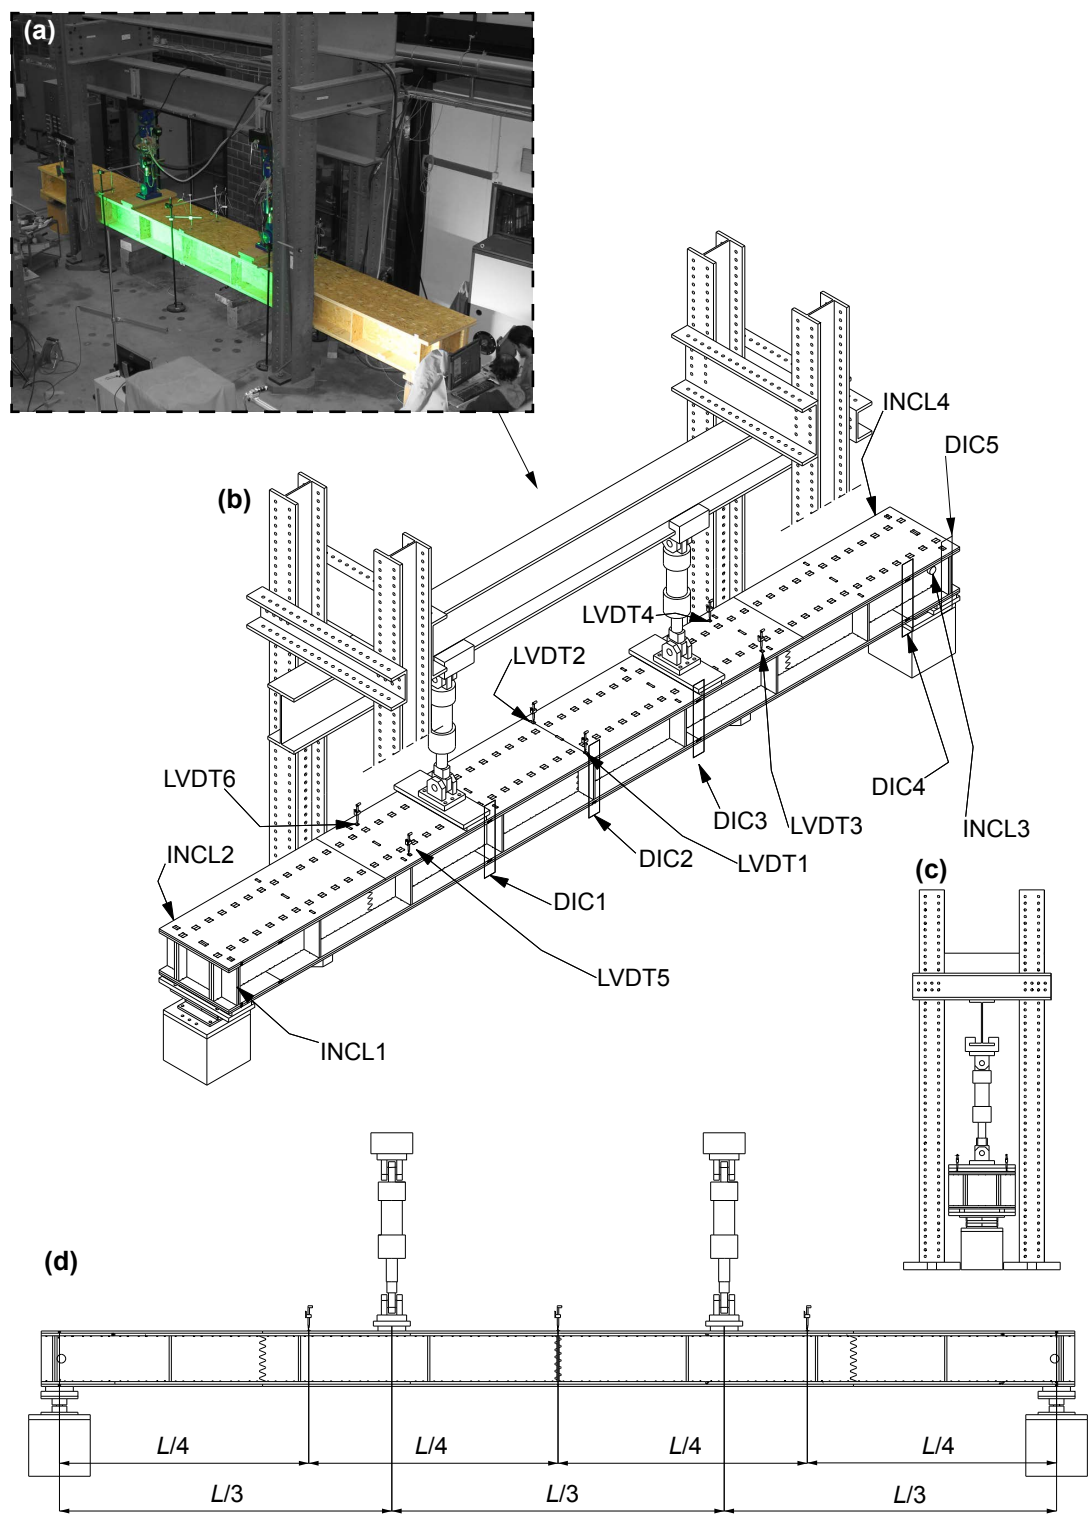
Four-point bending test setup for large-scale specimens: (a) Photograph of the setup during a test / (b) Technical drawing, axonometry / (c) Side view / (d) Front view.
